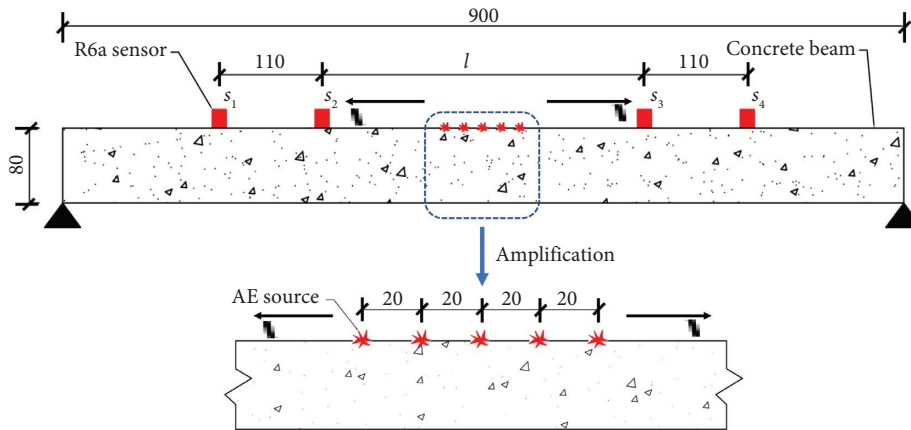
Detailed dimension of the concrete beam (unit: mm).
